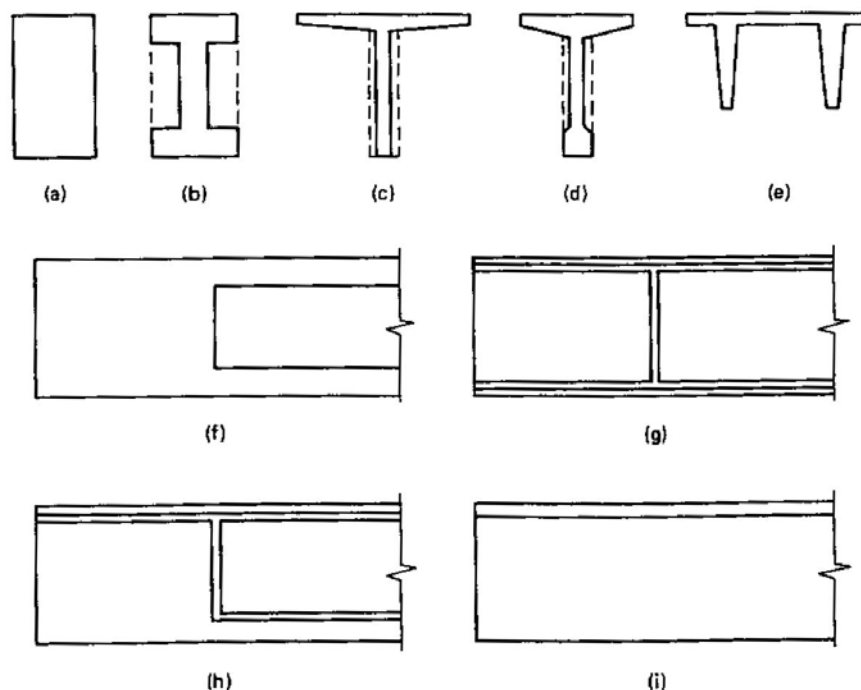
Typical prestressed concrete sections. (a) Rectangular beam section. (b) I-beam section. (c) T-beam section. (d) T-section with heavy bottom flange. (e) Double-T-section. (f) End part of beam in (b). (g) End part of beam in (c). (h) End part of beam in (d). (i) End part of beam in (e).
